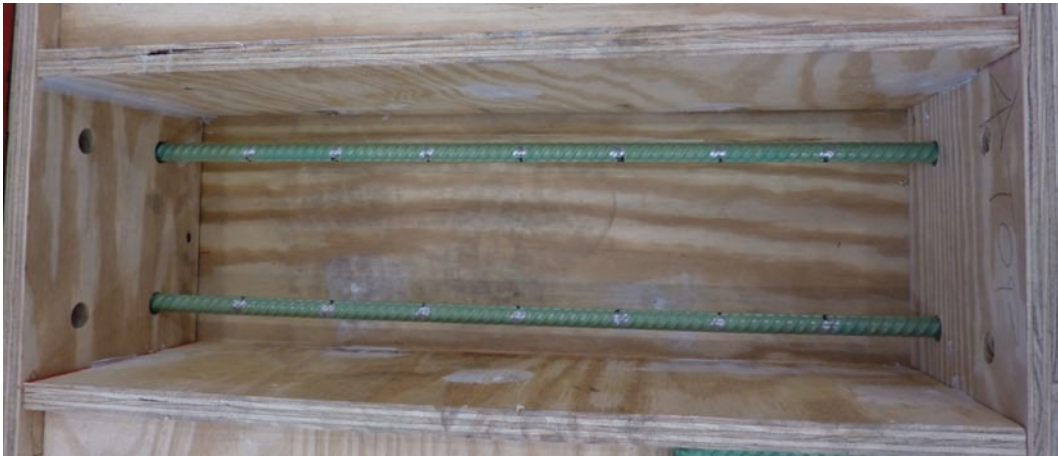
Bottom longitudinal epoxy-coated bars in formwork.
